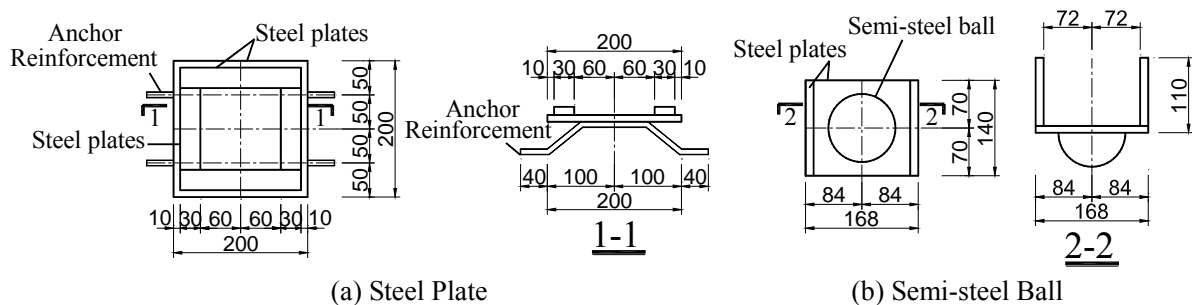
Detail Sizes of Test Specimen and Supporting Beams
